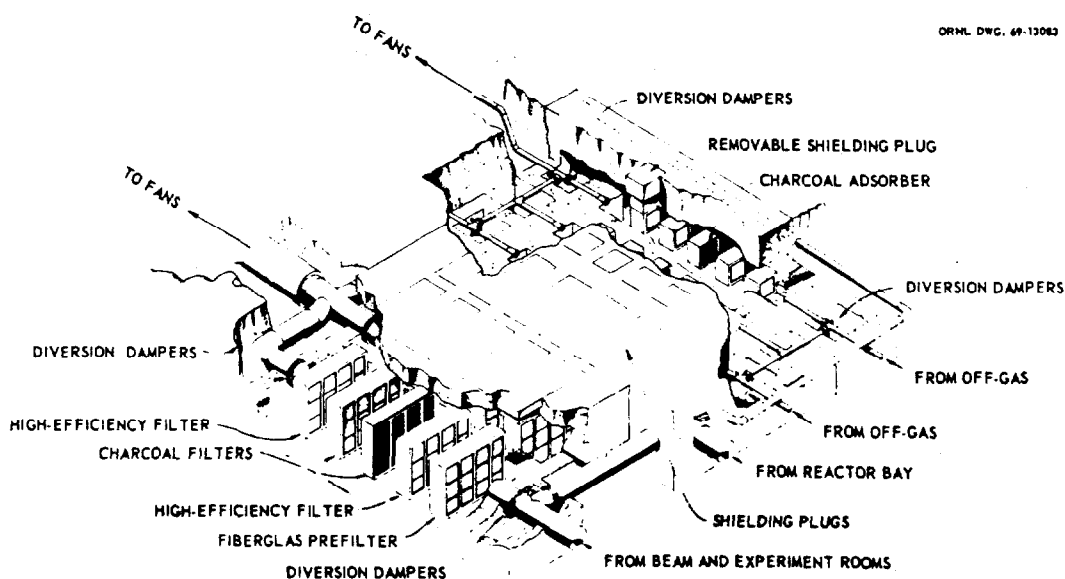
General arrangement of underground filter pits at High Flux Isotope Reactor, Oak Ridge National Laboratory. Demisters (not shown) are located in the ducts leading to the pits. Courtesy Oak Ridge National Laboratory.
